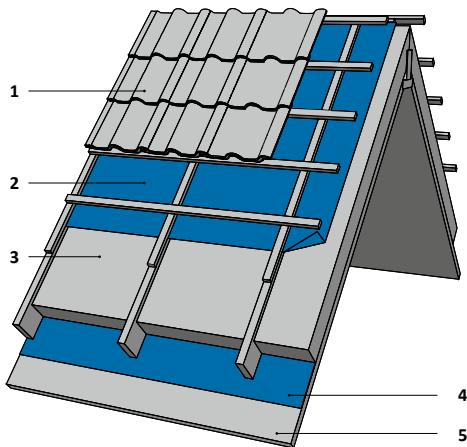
A system of layers in a standard, thermally-insulated, pitched roof with usable attic: 1. proper roof covering, 2. initial covering layer – STROTEX vapour-permeable film, 3. thermal insulation, 4. vapour barrier – STROTEX, BUDFOL or EKOFOIL vapour-proof membrane, 5. gypsum board.
